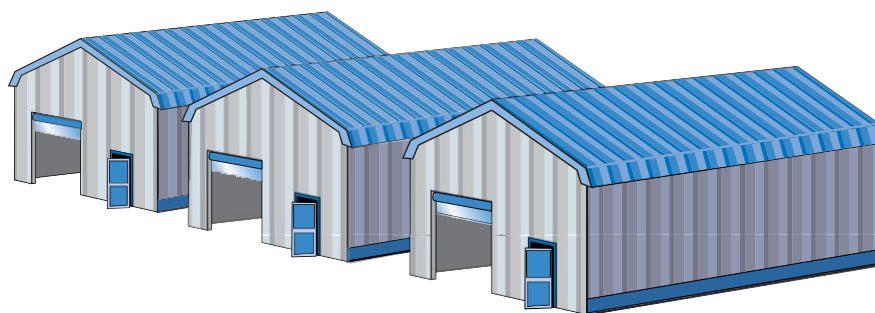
Buildings having a metal-frame and metal-cladding
